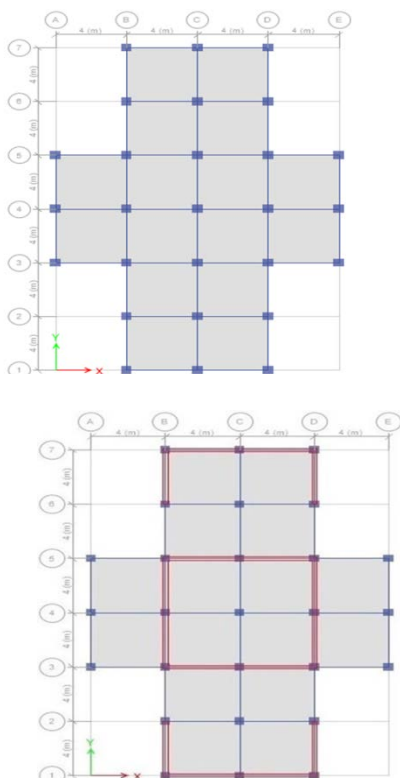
Plan of irregular structure P2 representing bare frame and frame with bracings and infill walls
